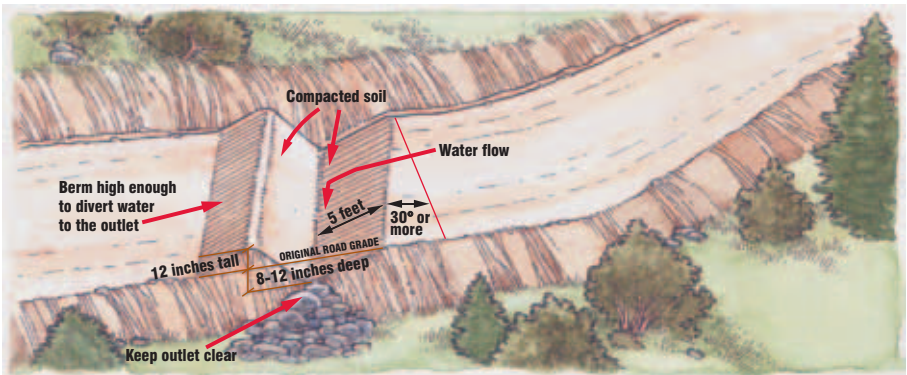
Diagram of recommended construction guidelines for a conventional waterbar in-road water diversion structure.
